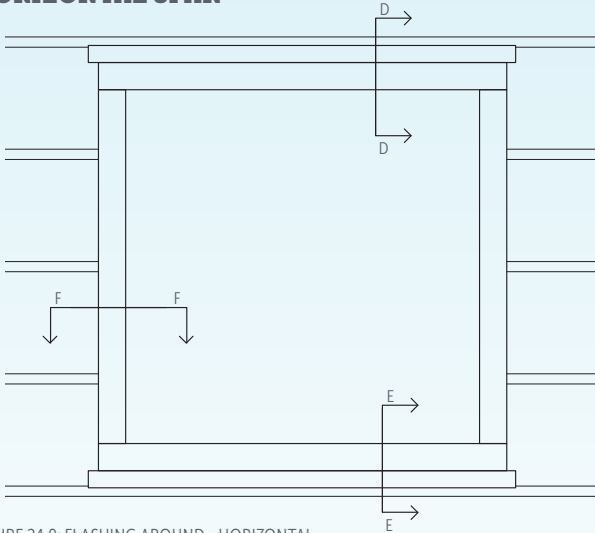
FLASHING AROUND - HORIZONTAL FRONT VIEW
